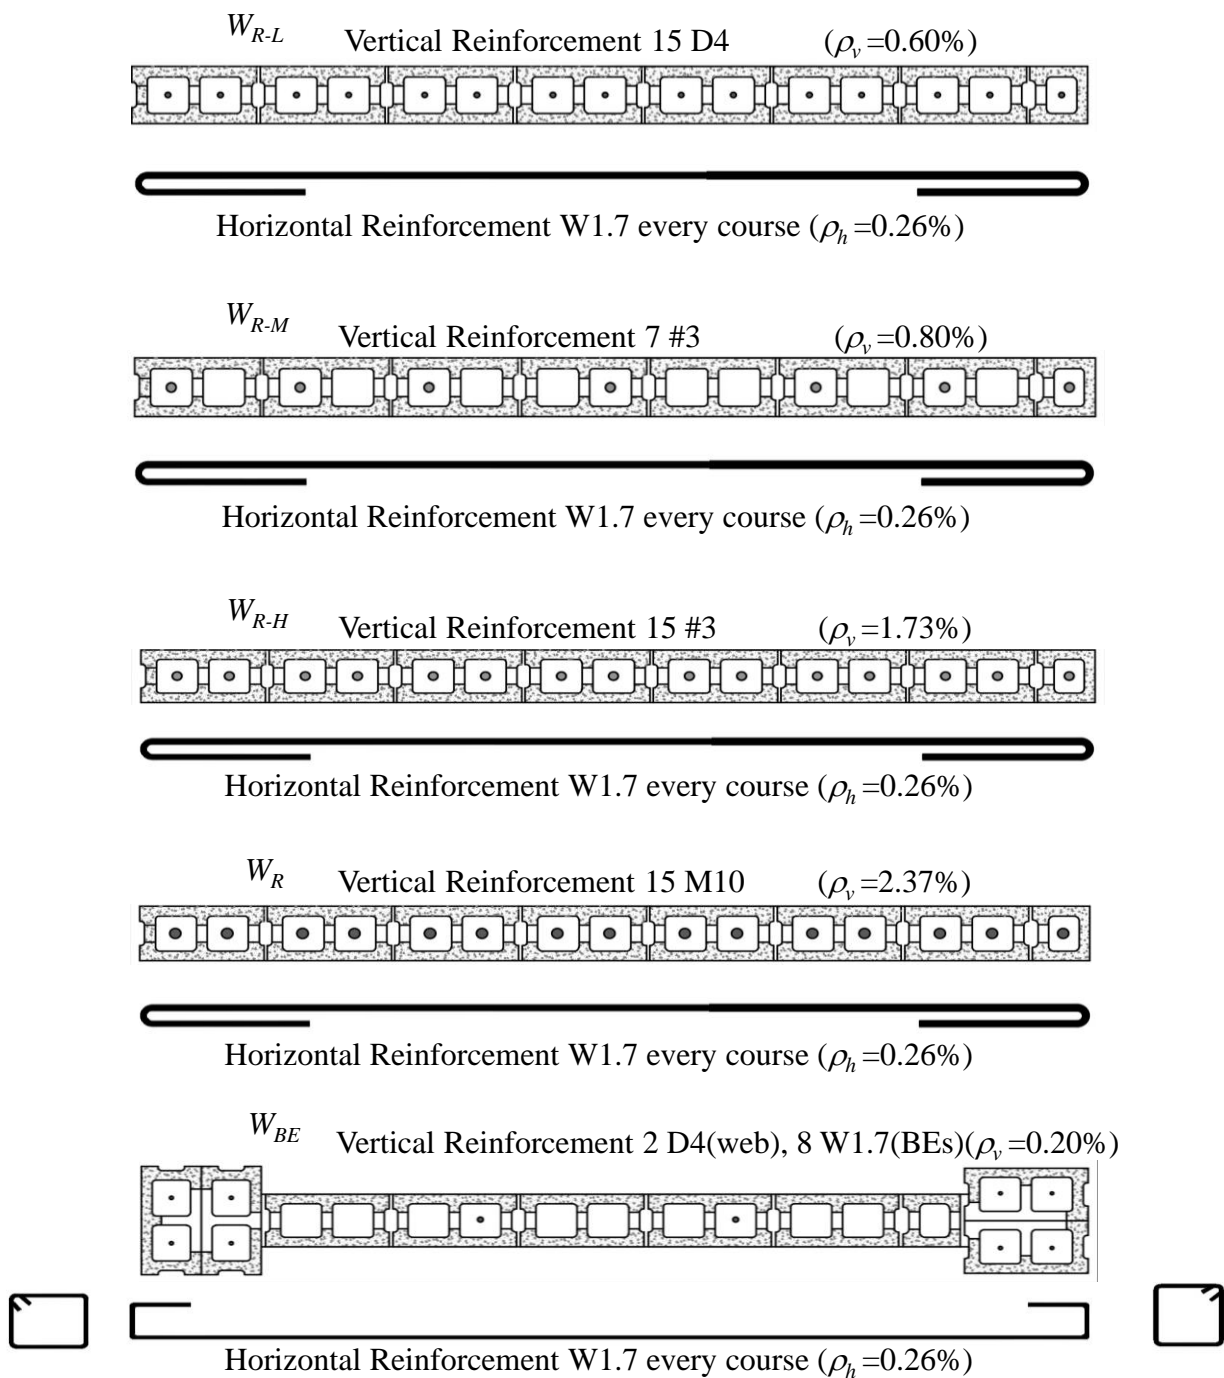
Reinforcement details of numerically generated RM shear walls
